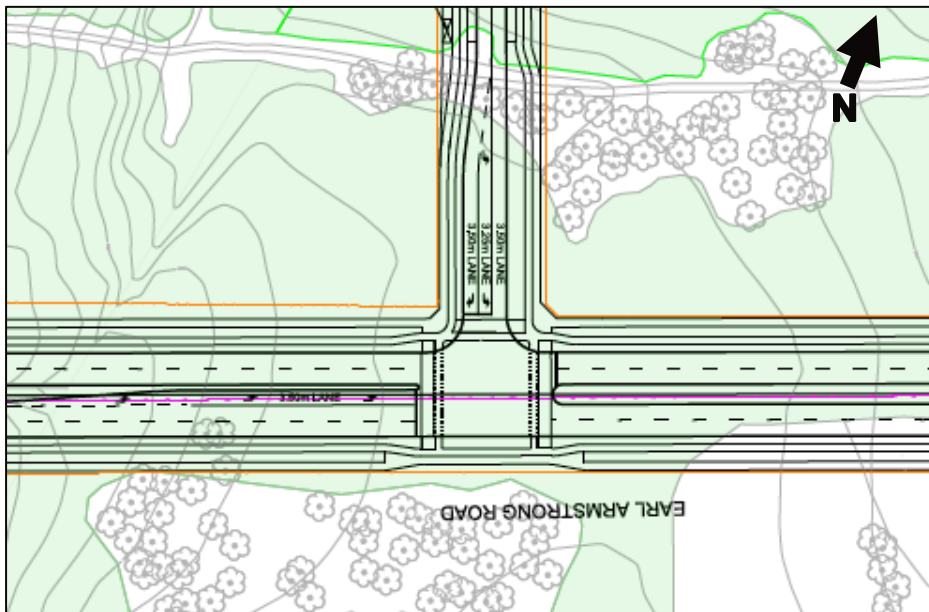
Future Earl Armstrong Road & Kelly Farm Drive Intersection
